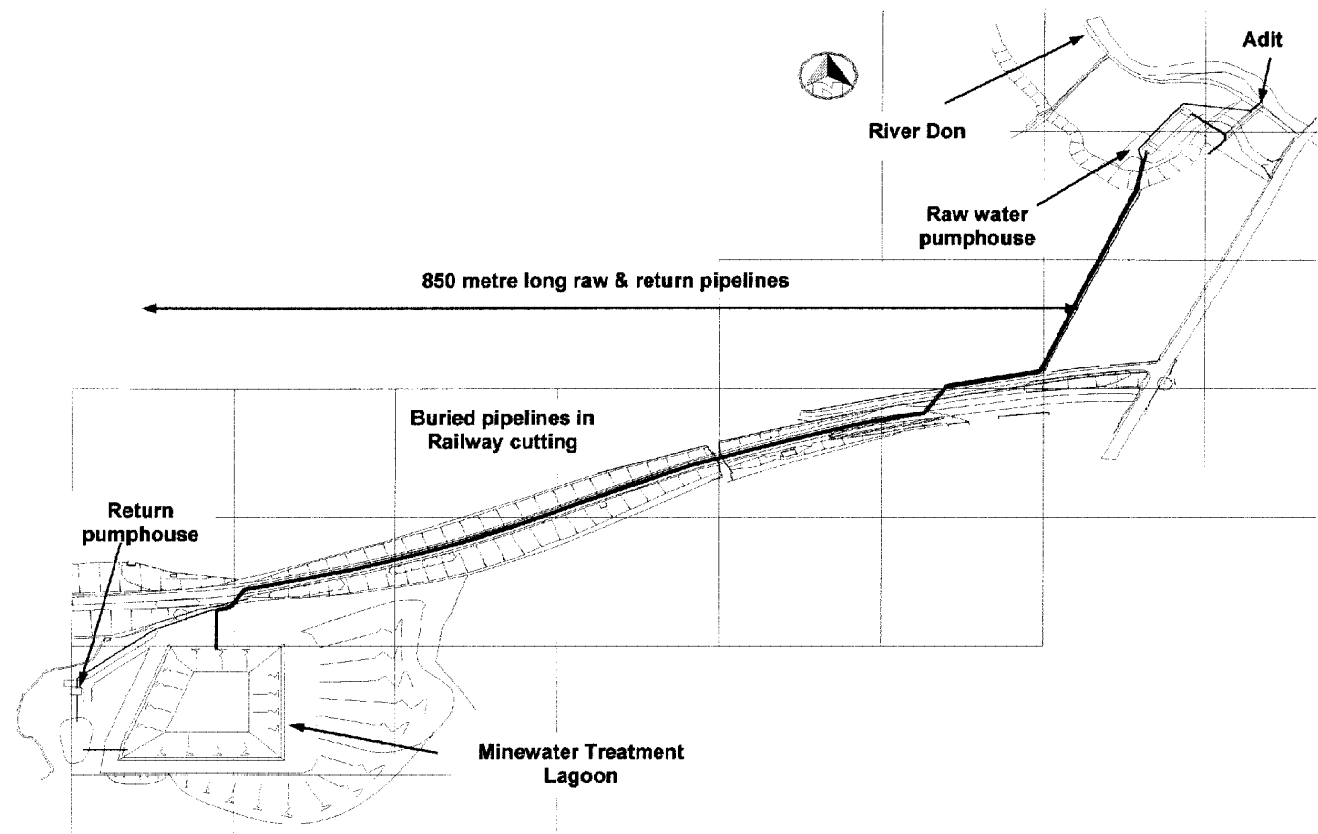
Schematic layout of Bullhouse mine-water scheme
